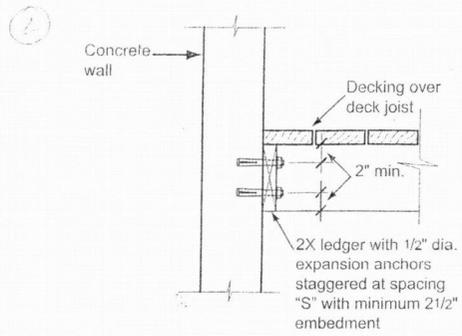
Attachment of Ledger Board to Concrete Wall (See Fig. 12 for spacing and clearances)
